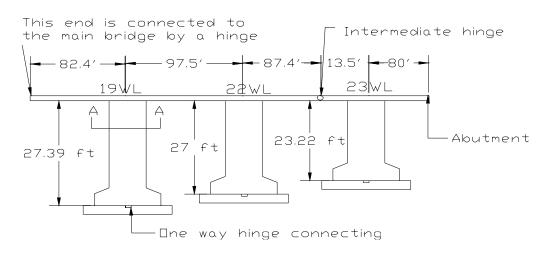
The Elevation view of 1RWL-2RWL Off-Ramp (not to scale)
